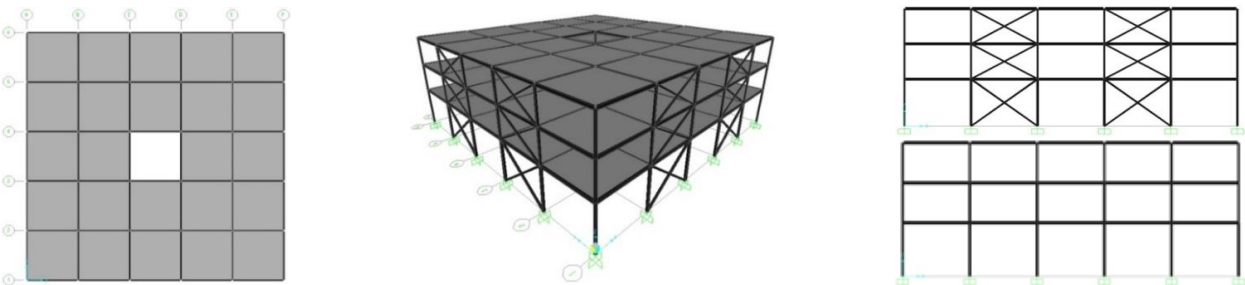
The plan, a 3-D view and the internal and external frames of the 3-story conventional building
